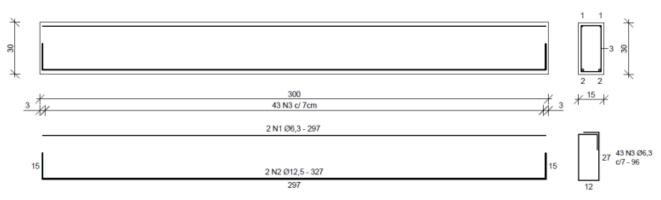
Reinforcement Detailing of Reinforced Concrete Beams.
